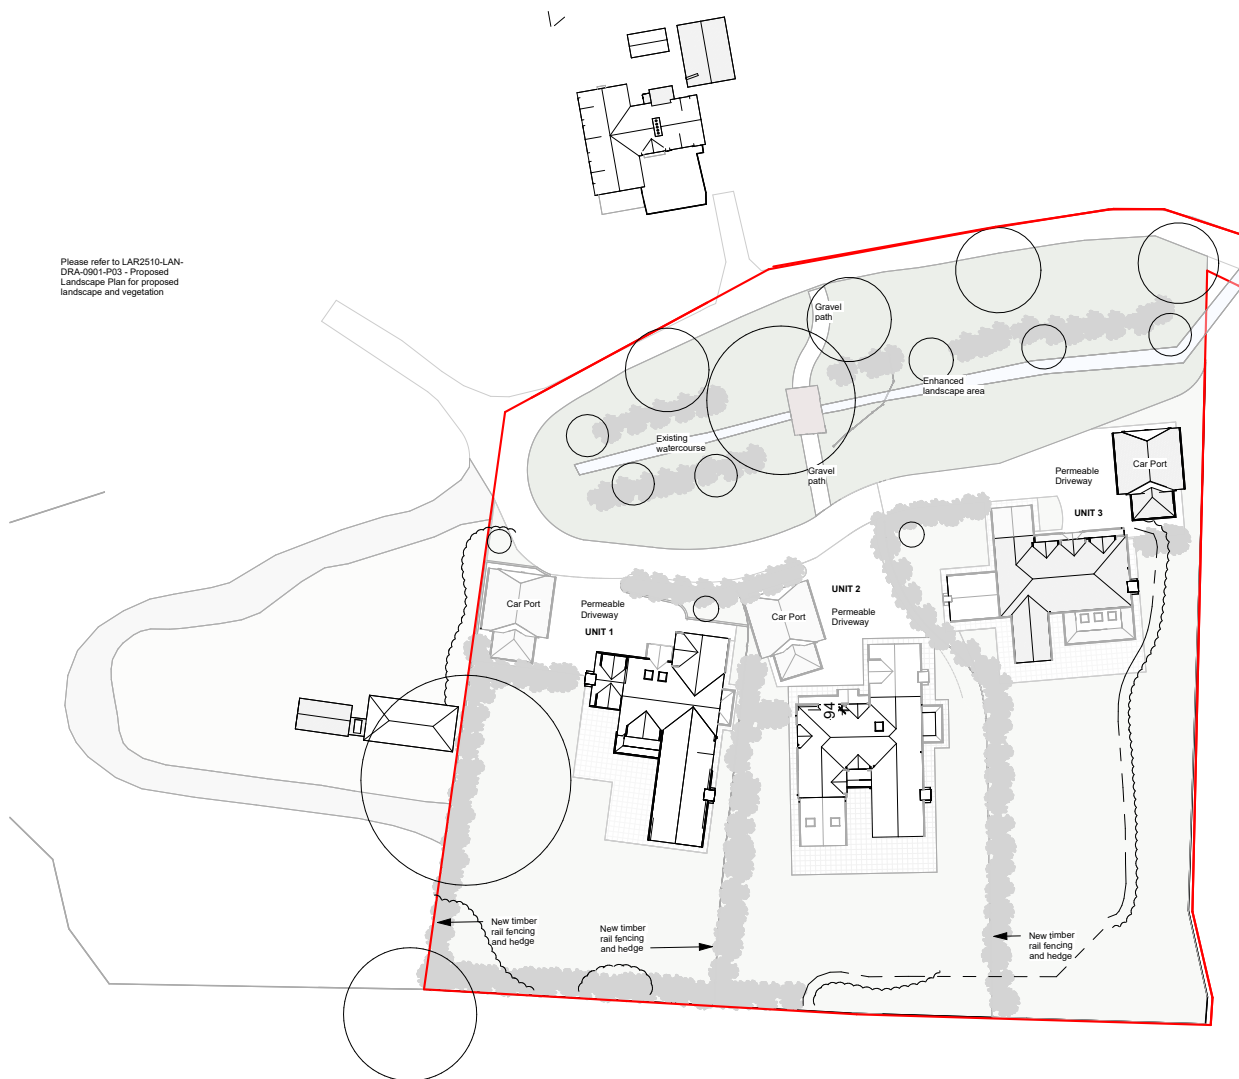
Proposed Site Plan (Fresh Architects, June 2025)
